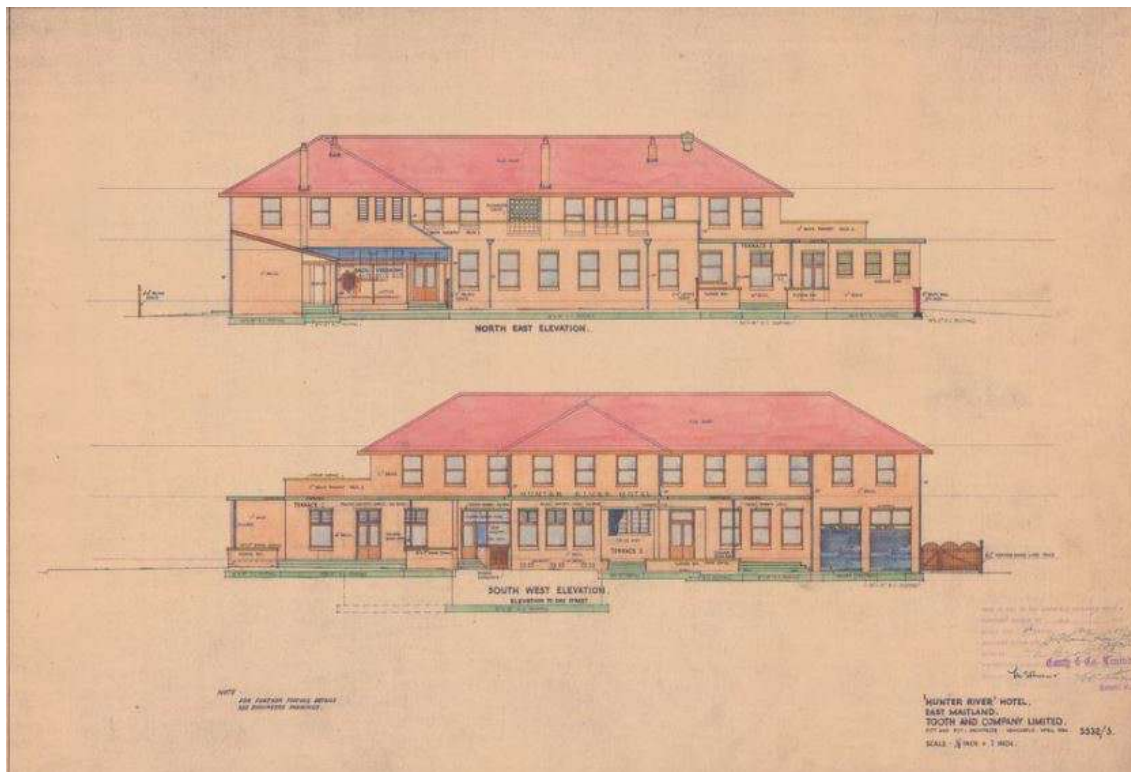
Architectural drawing for Hunter River Hotel East Maitland, New South Wales
